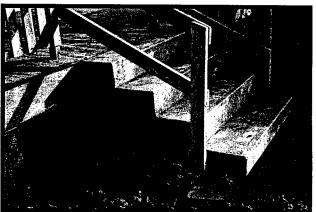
A detail of the concrete replacement steps at Standing Structure 55-1011.
